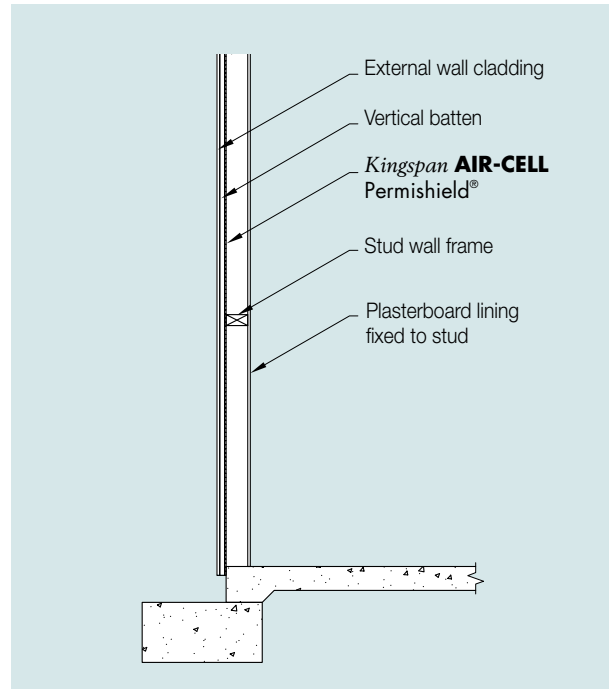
Side elevation of Kingspan AIR-CELL Permishield® on timber-framed wall
